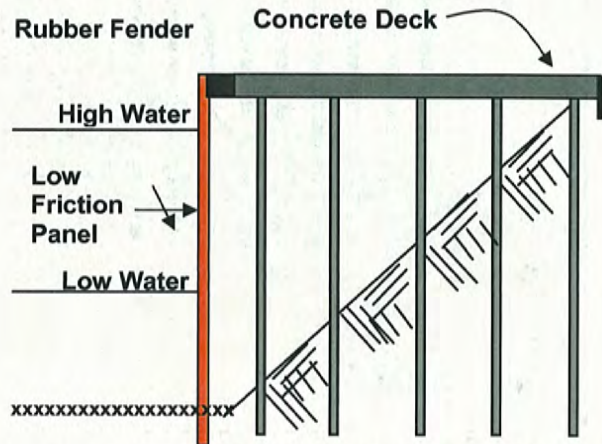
Cross-section through Schematic of Pile-Supported Deck
